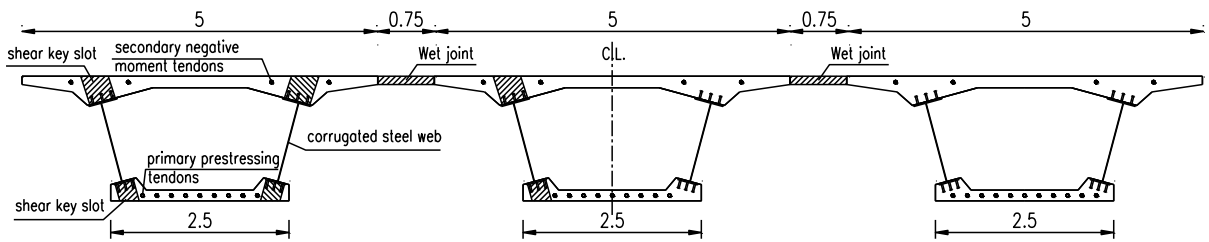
Schematic diagram of composite beam structure section – system III (Unit: m)
